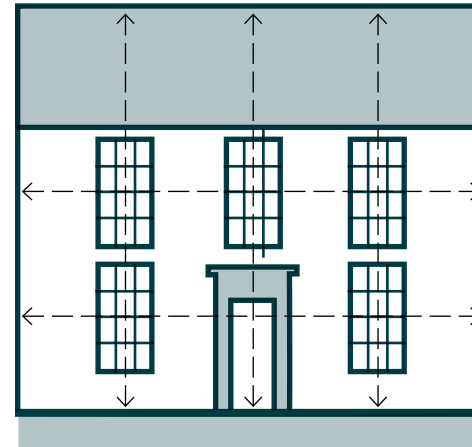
Diagram showing example building proportions in a Georgian or Victorian detached house. The proportion of a building's elements should consider the scale and proportion of the overall building.
